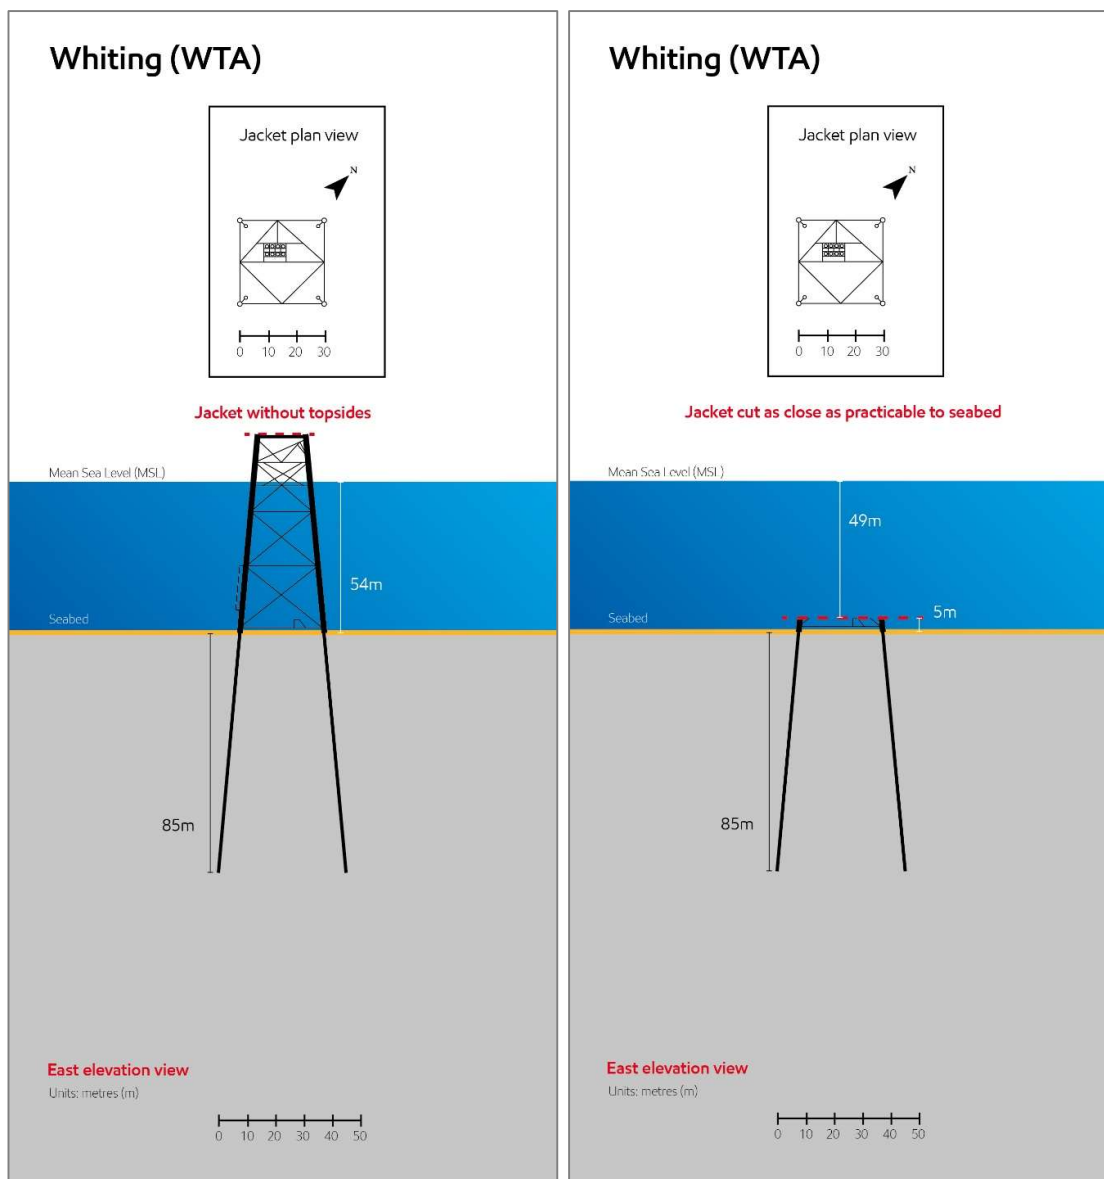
Whiting Steel Piled Jacket without topsides (left) and Steel Piled Jacket under proposed end state (right)
